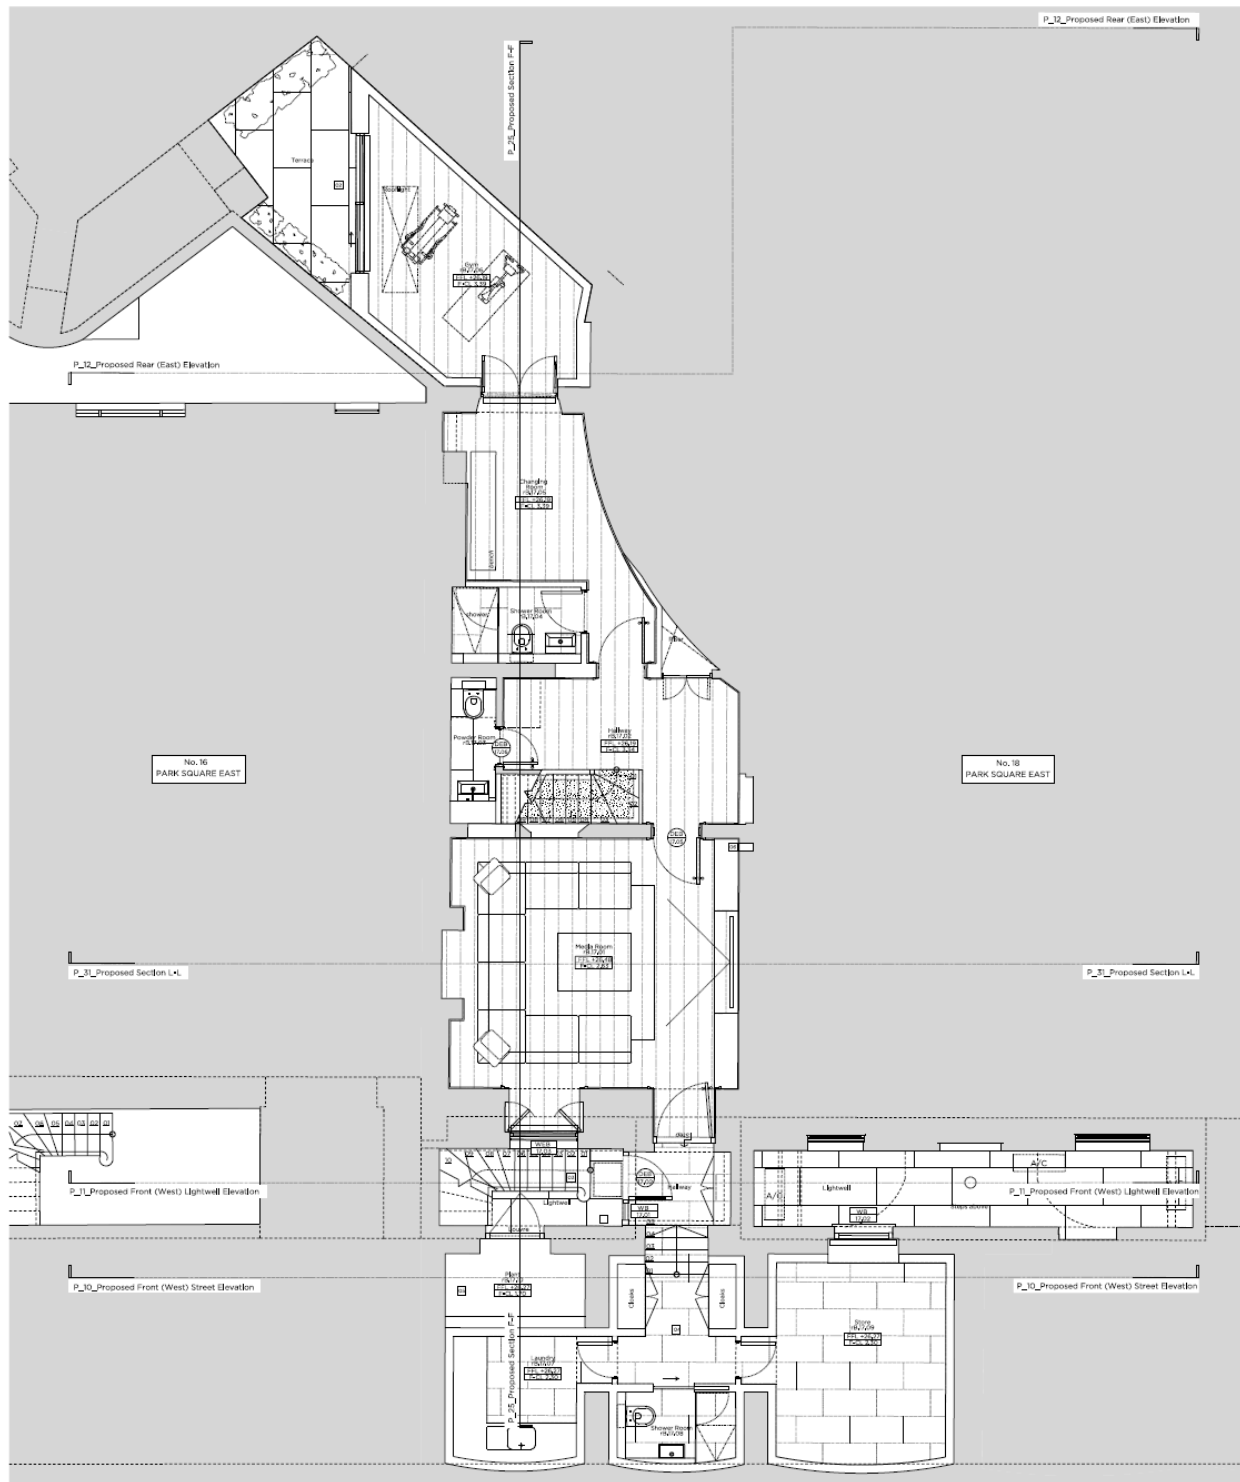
Proposed basement plan, showing rear extension and alterations to the vaults. MWA, February 2020.
